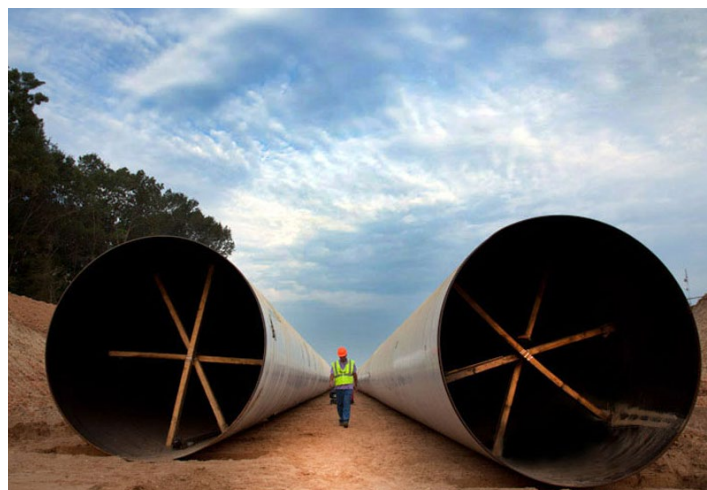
AMERICAN spiral welded steel pipe being installed in a parallel trench setting.
